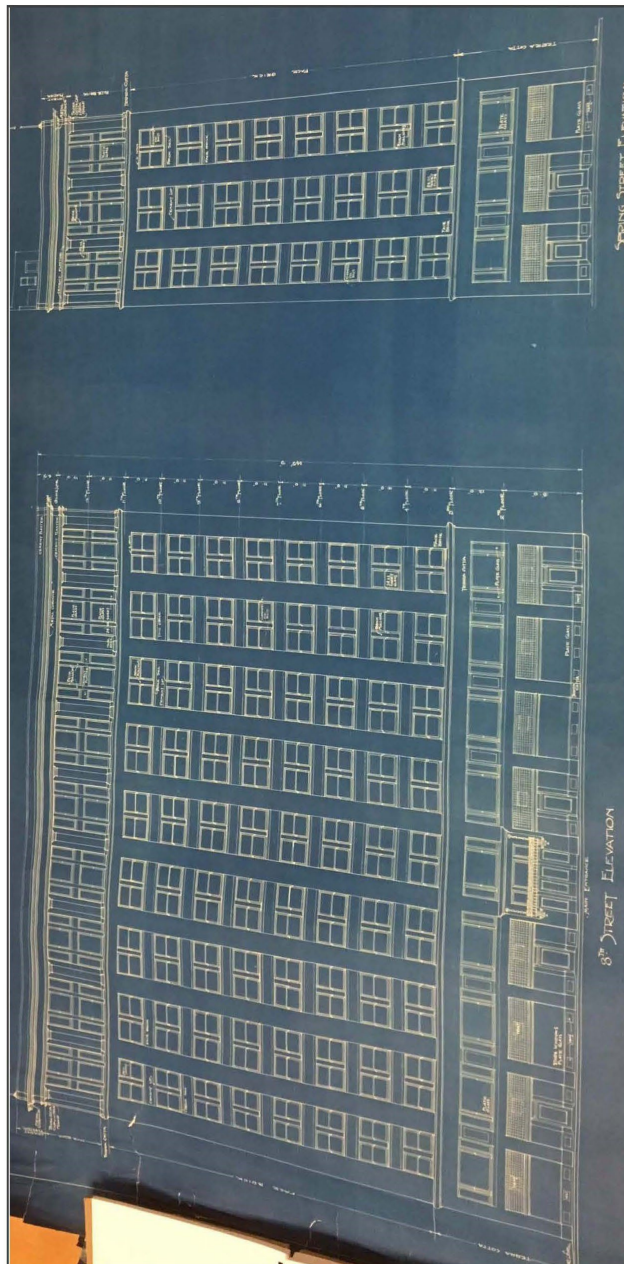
Lane Mortgage Building north and east elevations. Source: Loy L. Smith, "Lane Mortgage Building, S.W. Corner of 8th and Spring Streets, Los Angeles," January 4, 1922, City of Los Angeles, Department of Building and Safety
